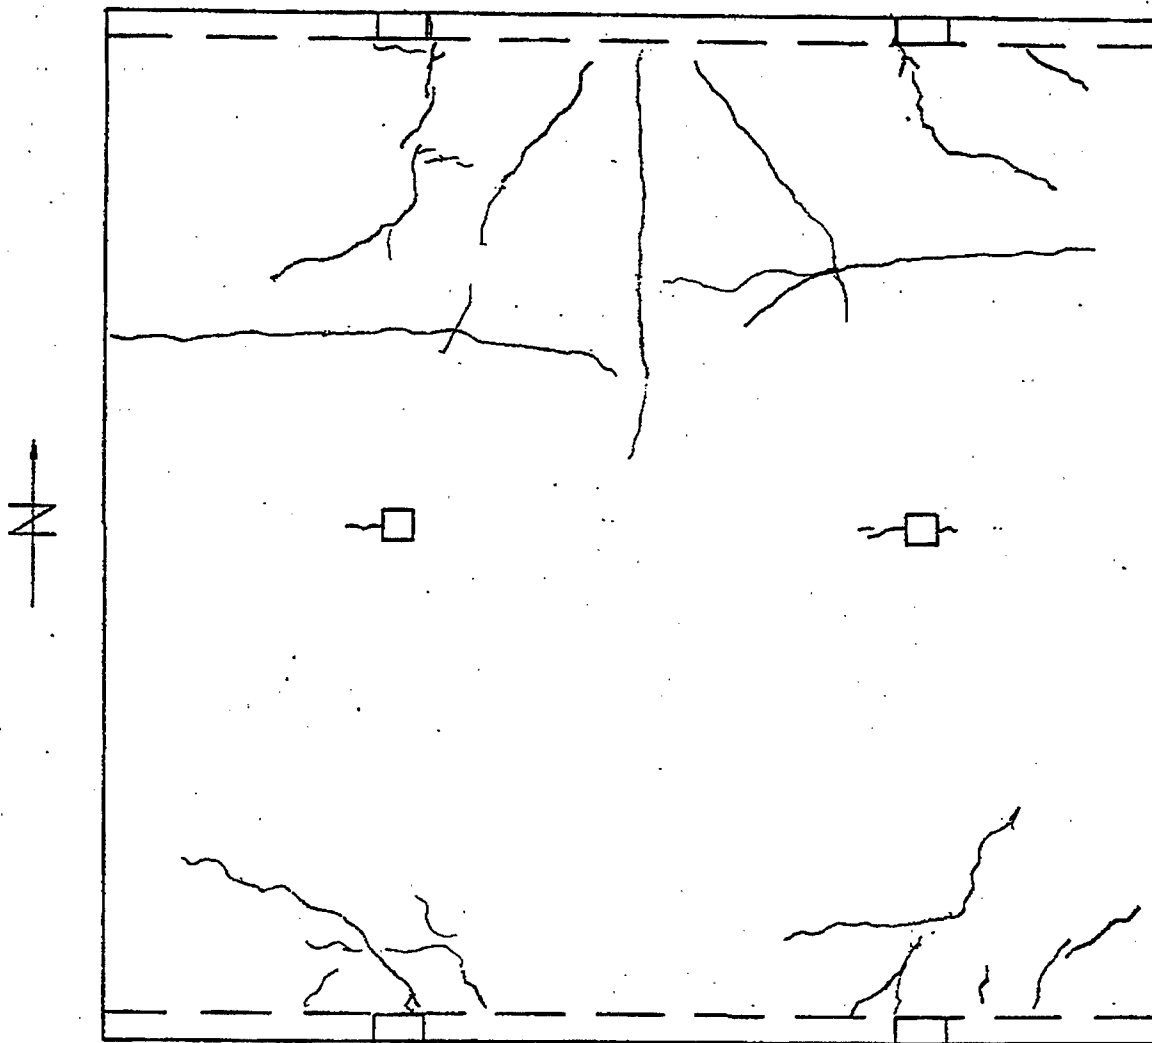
Crack Pattern, Third Floor Slab, Bottom Side, Post-T420DL
